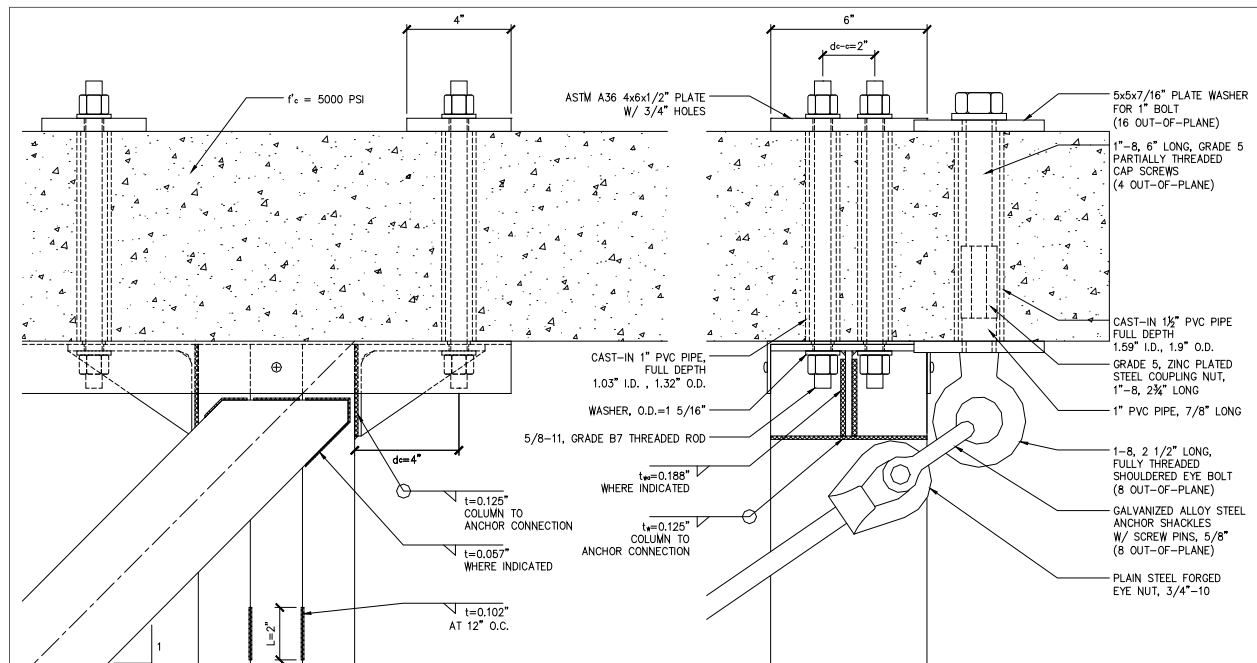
In-plane and out-of-plane connections and anchorage details at the first-story slab.
